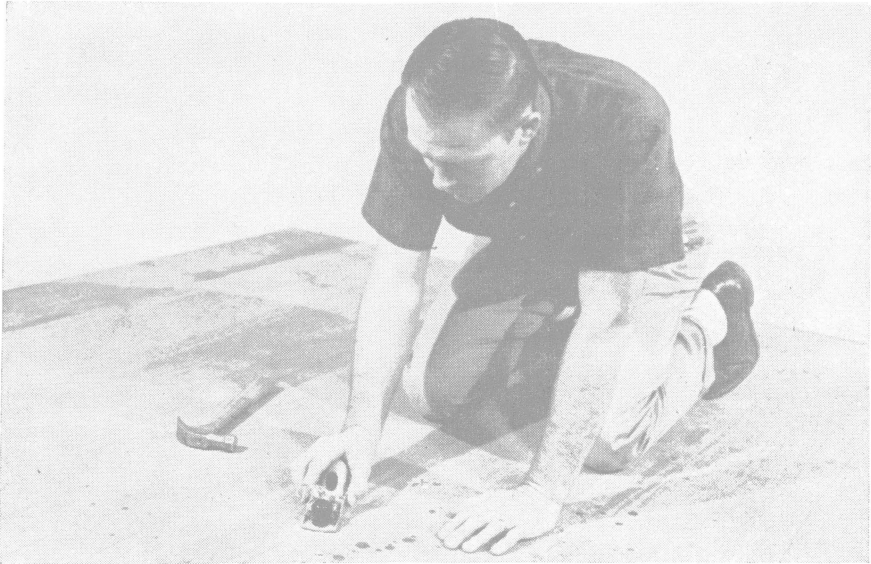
Before applying flooring materials over old, double wood floors, replace damaged boards, renail loose boards and plane or sand warped areas. Sanded areas should be properly filled with a recommended floor filler.
